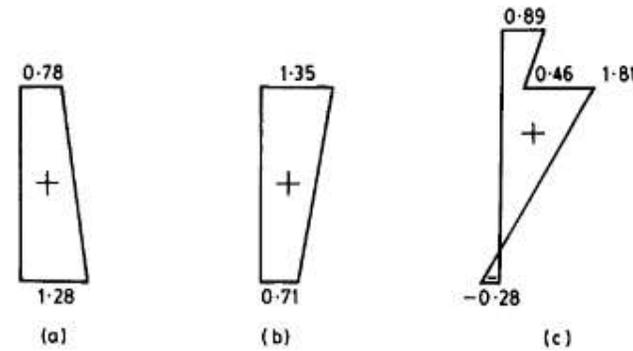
Stress distribution for composite section in Example 10.1 (N/mm^2): (a) beam; (b) beam and slab; (c) beam and slab and imposed load.
